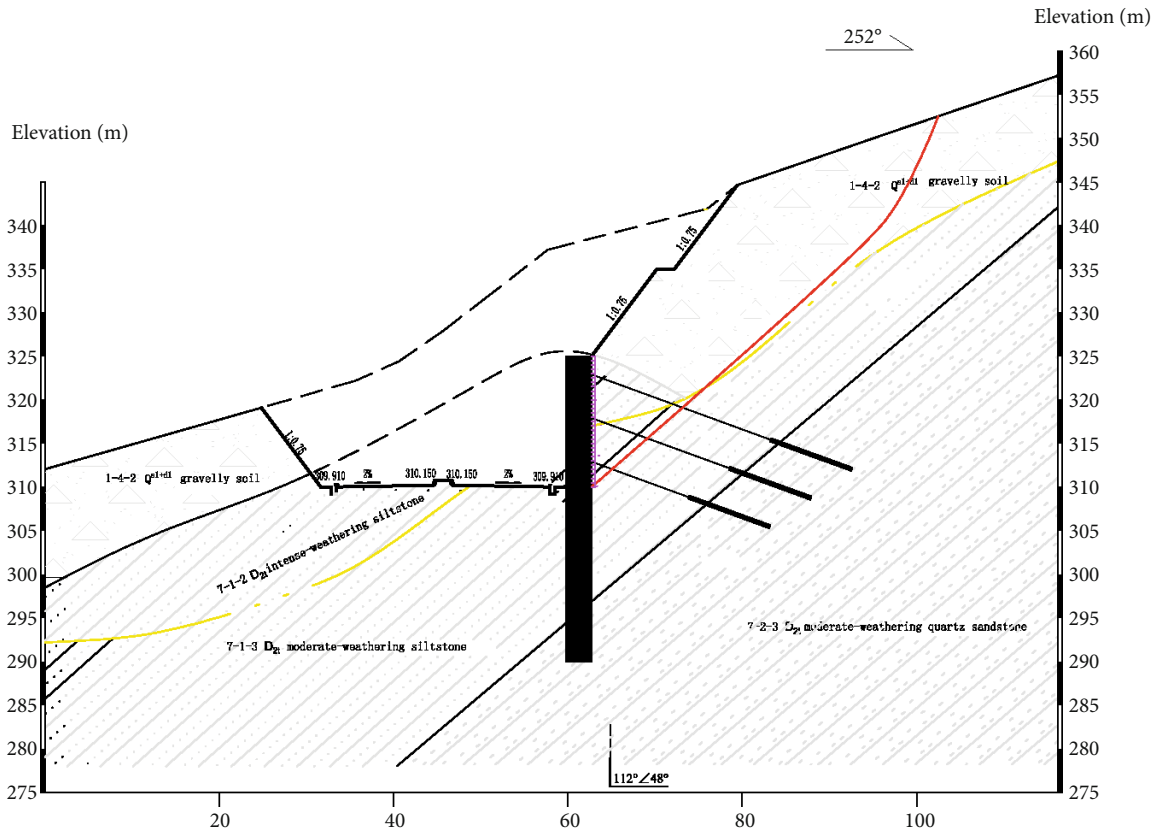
Engineering geology cross-section profile with reinforcement work of the cut slope (A-A').
